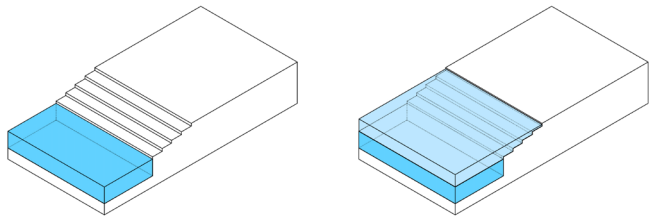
Terracing Riverbank Walls. (Author's elaboration).
